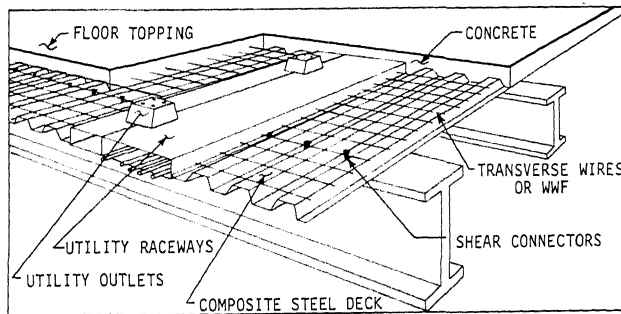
Typical building floor construction utilizing cold-formed steel decking with composite support beams.
